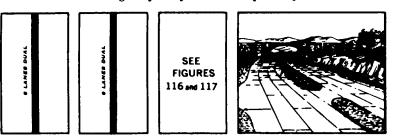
Road Under Construction. Only roads on which construction is actually under way are shown. If information is available, the classification of the completed road is shown by the proper road fill. Proposed roads are omitted.
